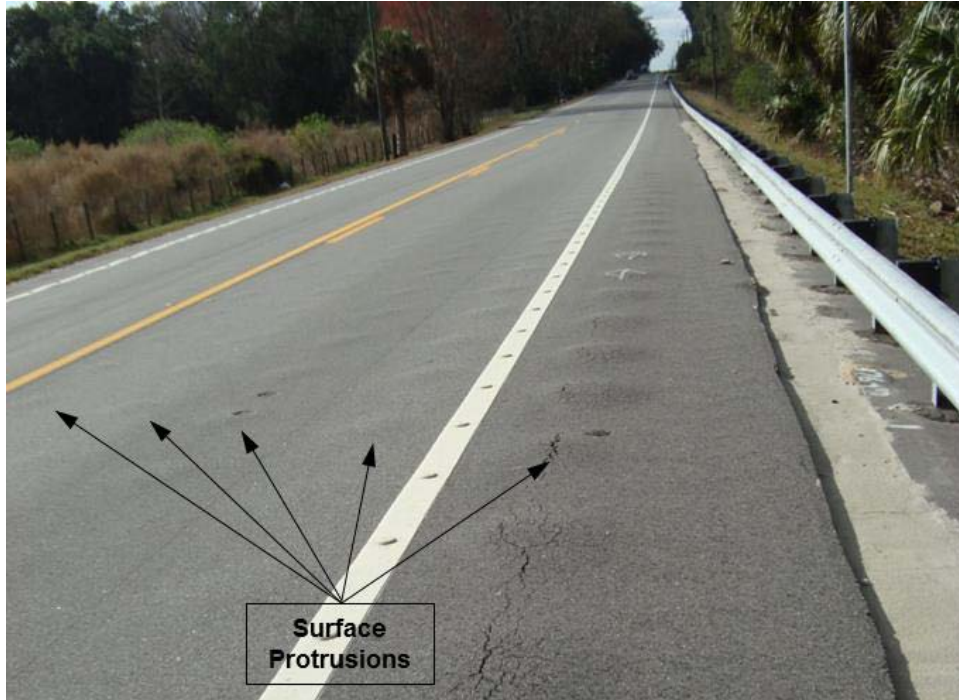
Cement stabilized column protrusions in the asphalt surface on SR 100.
